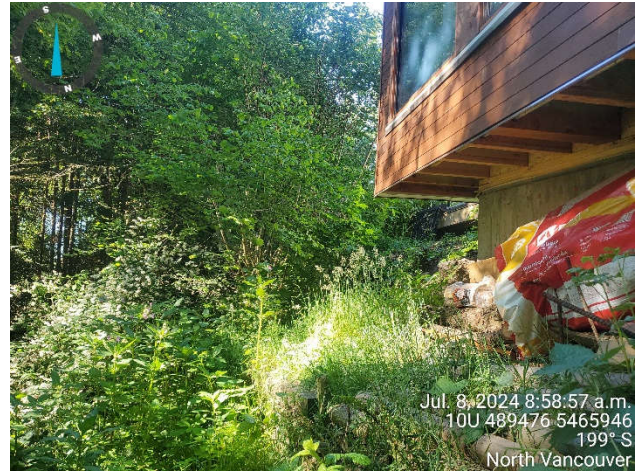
View of the south side of the unpermitted building overhanging ToB.
